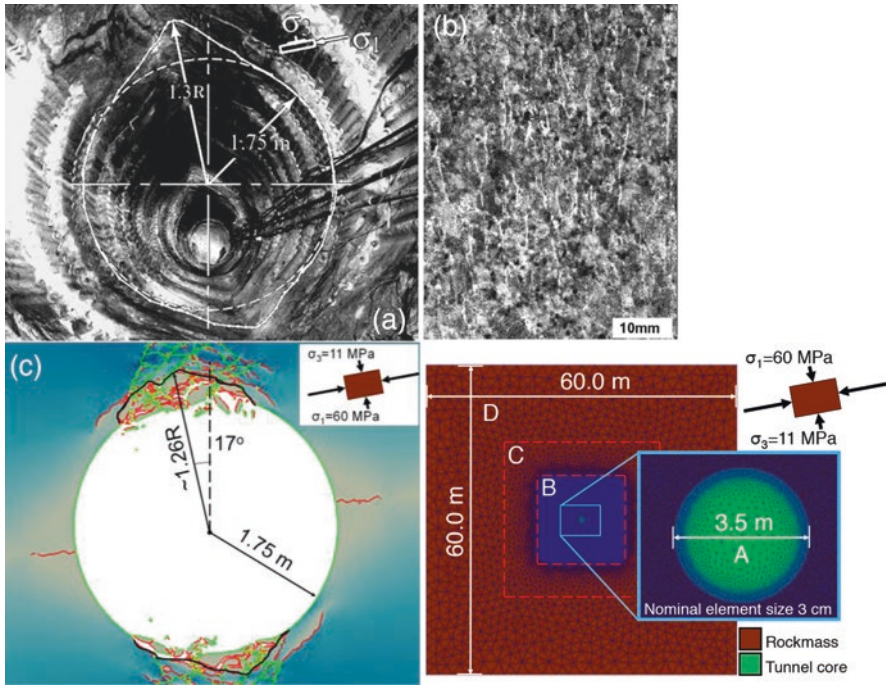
(a) Photograph of the URL Test Tunnel and the “v-shaped notch” failure due to brittle failure (spalling) (Diederichs 2007), and (b) detail of cracks (dyed white) in compressive test sample of Lac du Bonnet granite (Diederichs 2000). (c) Calibrated tunnel model using the FDEM method developed in Irazu replicating the brittle failure observed at the URL Test Tunnel
